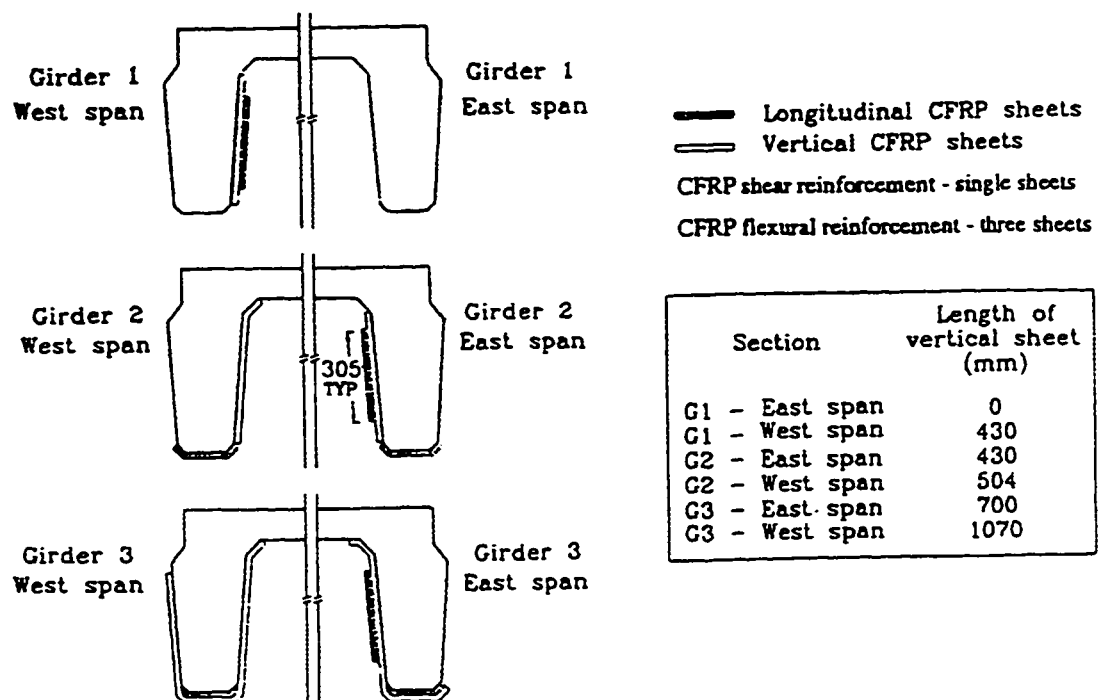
Reinforcing Layouts of Concrete Girders Reinforced with CFRP Sheets for Flexure and Shear (Drimoussis and Cheng, 1994)
